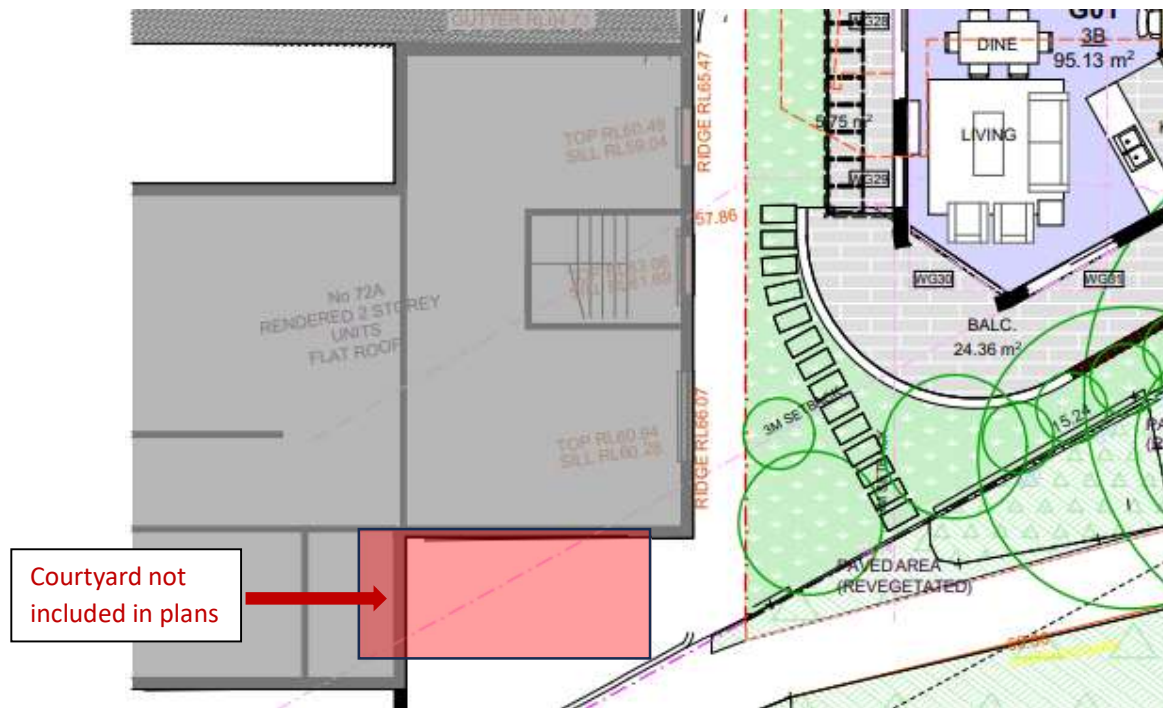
Plans - Master Set 'Ground Floor Plan' pg3
